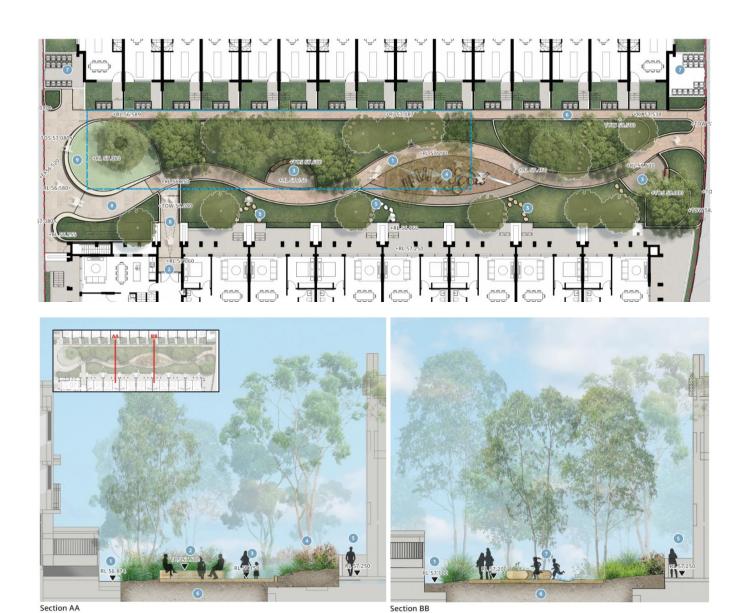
Proposed Ground Level Bush Garden Detail Plan (above) and Sections (below) Source: Arcadia
